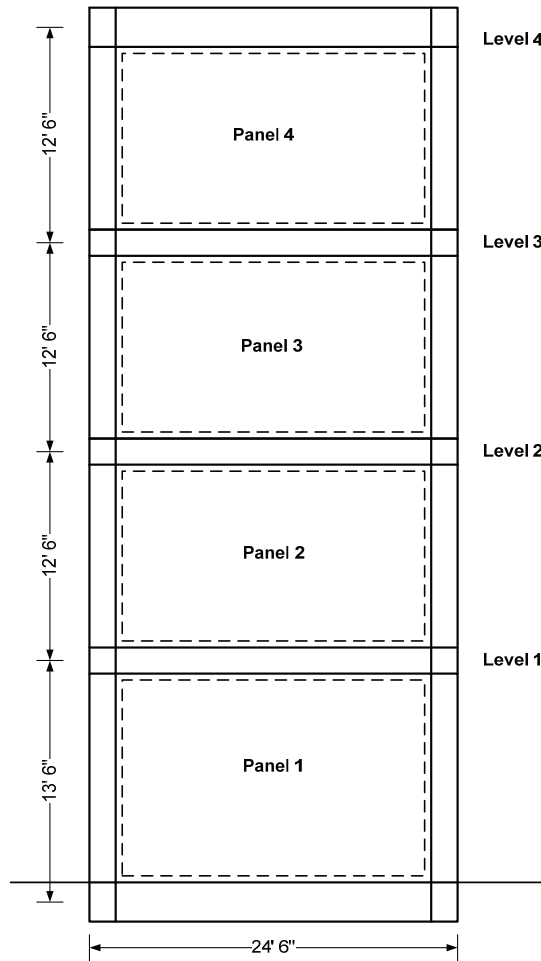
Elevation View of the Example 4-Story SPSW Frame (Berman and Bruneau, 2008).
